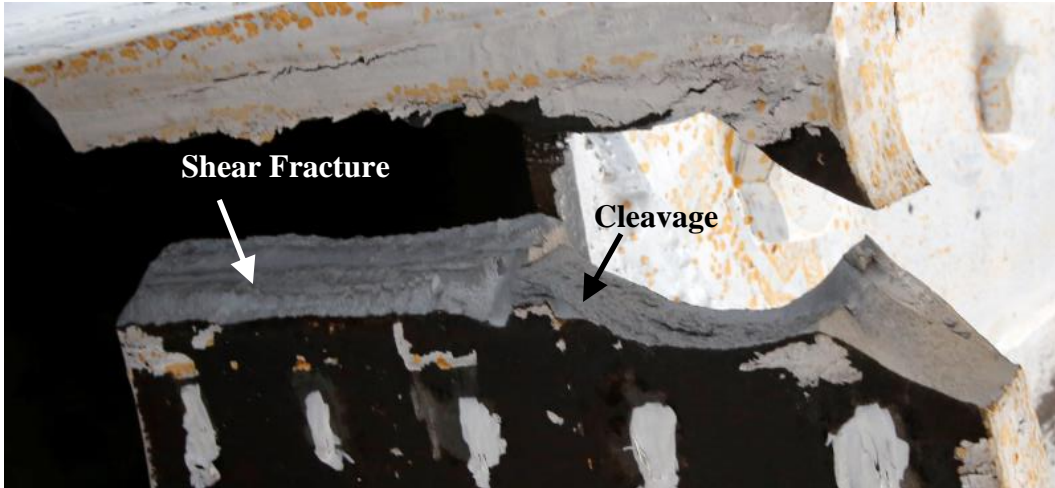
Specimen W4: East Beam Top Flange Fracture
